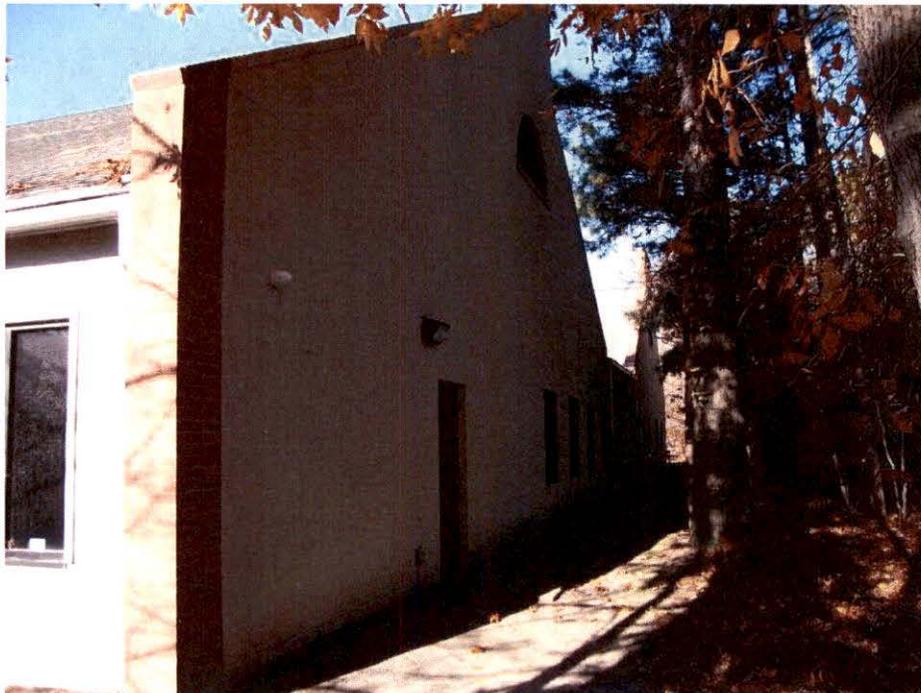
Trees encroaching foundation of 1651 Merrimac Trail Bldg. and also causing damage to roof systems from falling branches.
